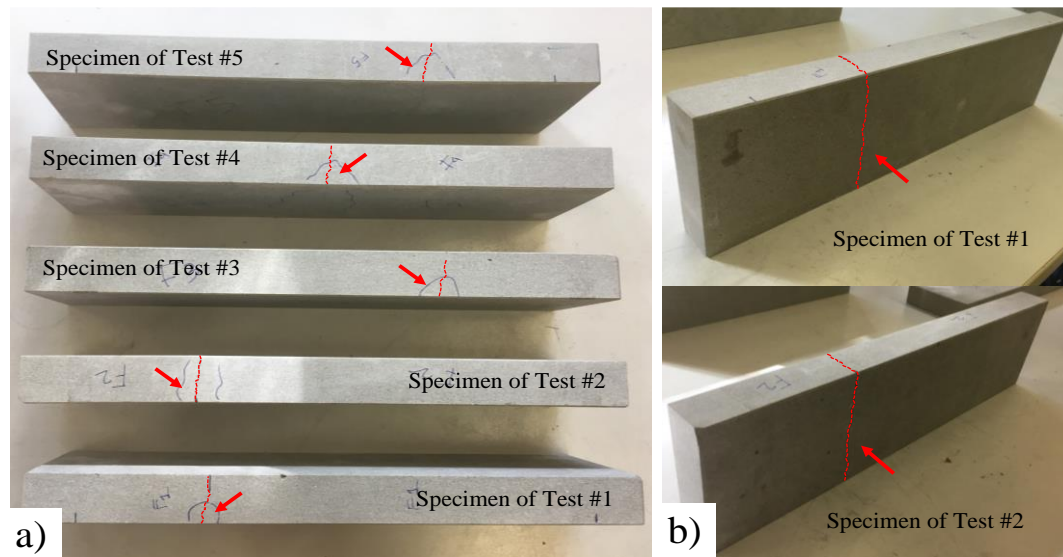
The broken specimens after performing the flexural test; (a) front view; (b) isometric view (Mardalizad et al., 2017c).
